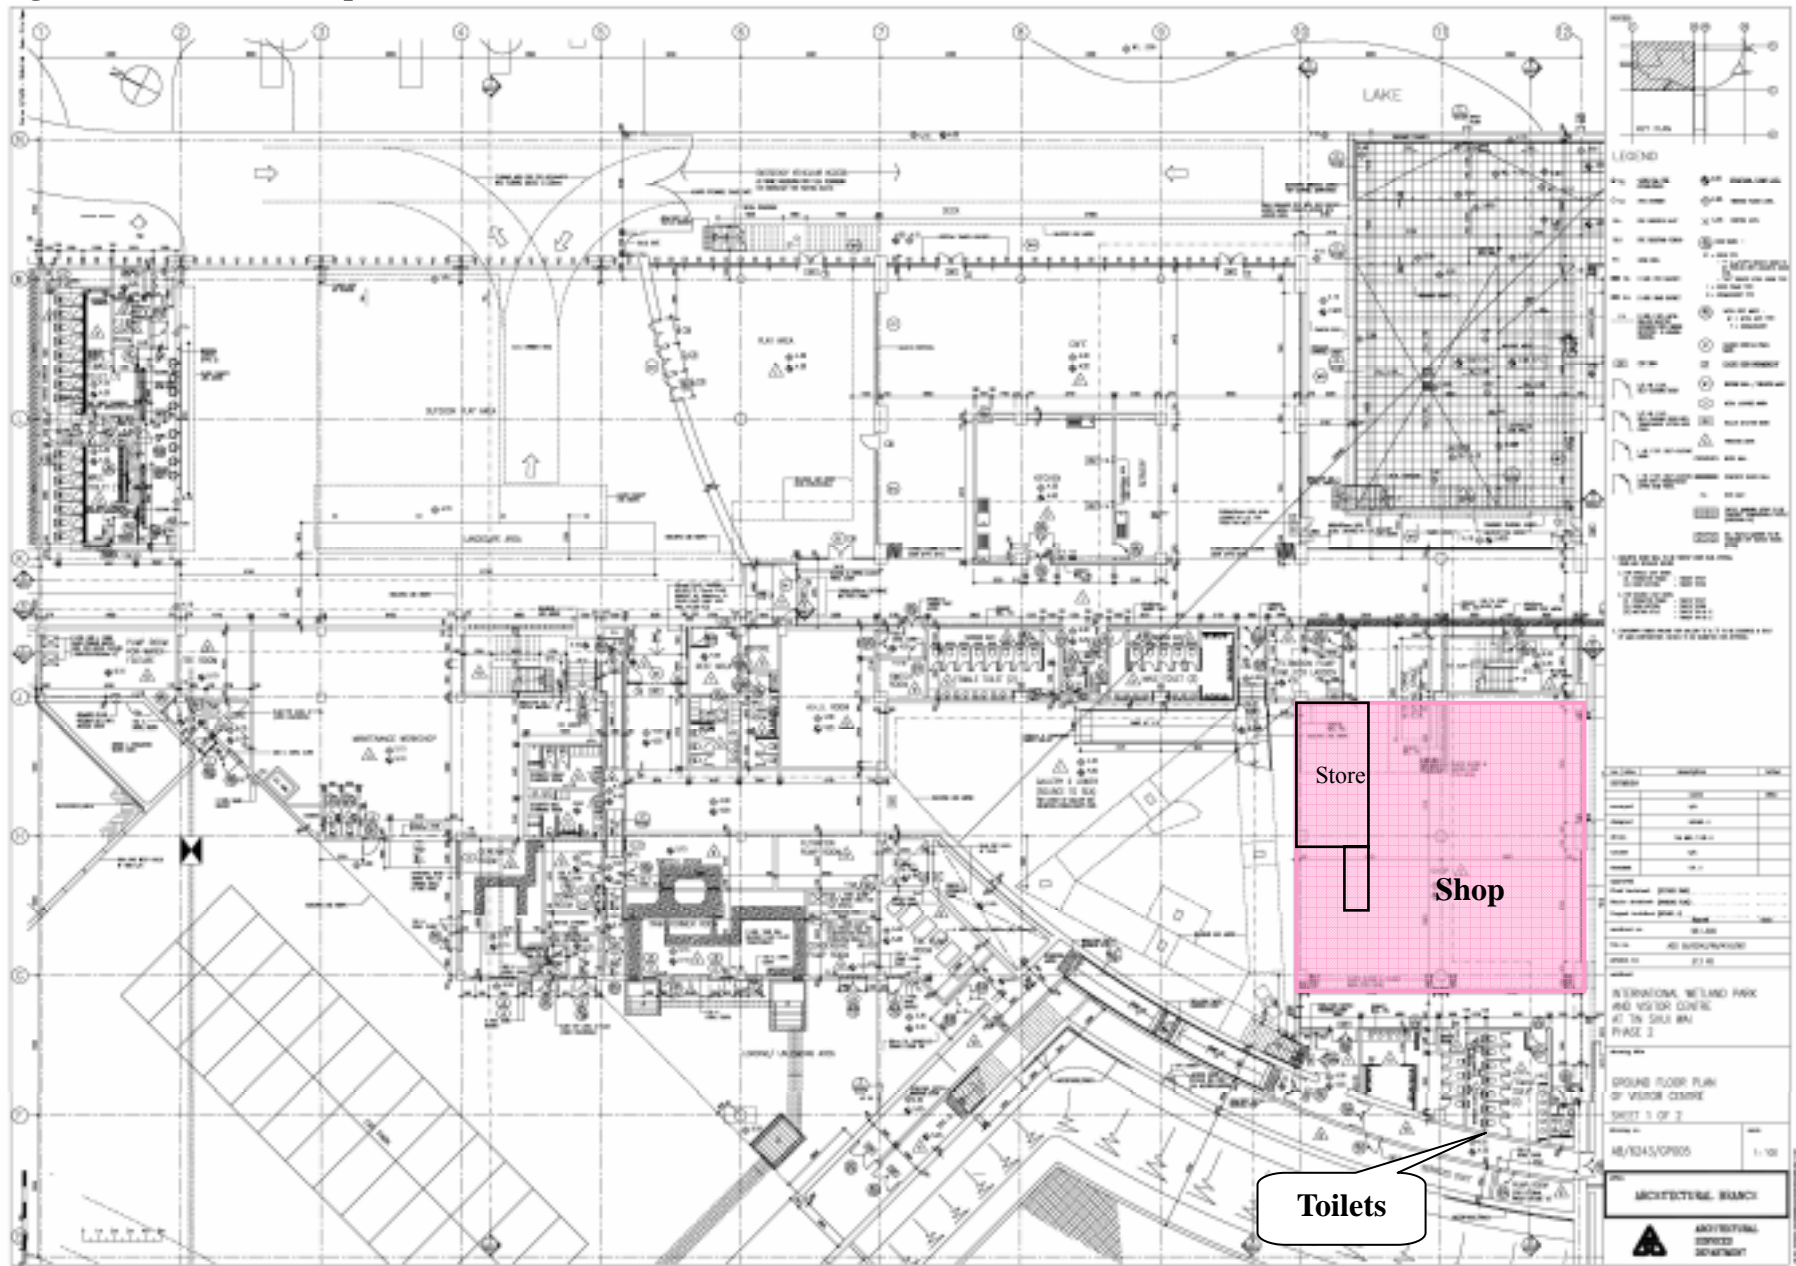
Ground Floor Plan of Visitor Centre of HKWP
